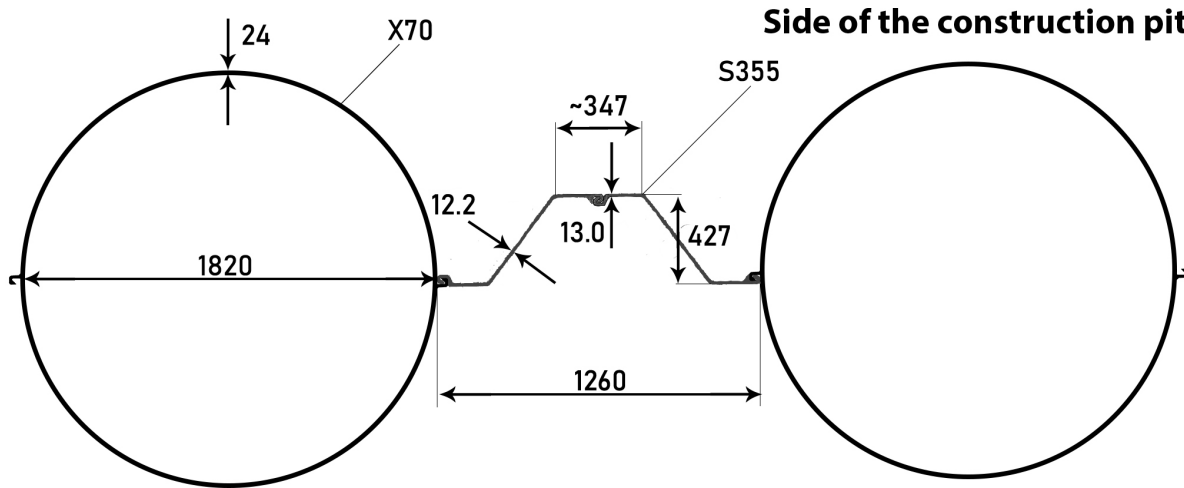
Combi wall of tubular piles with AZ26 sheet piling.
